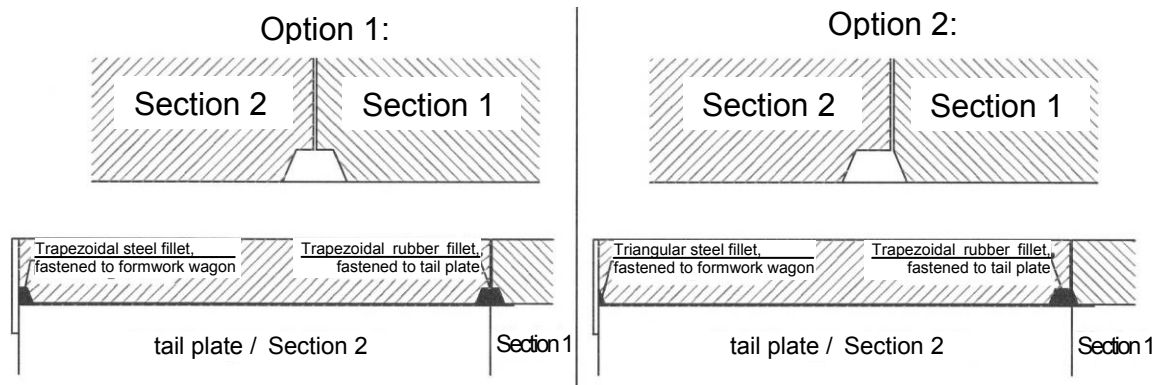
/1 Examples of joints in inner shells of traffic tunnels
